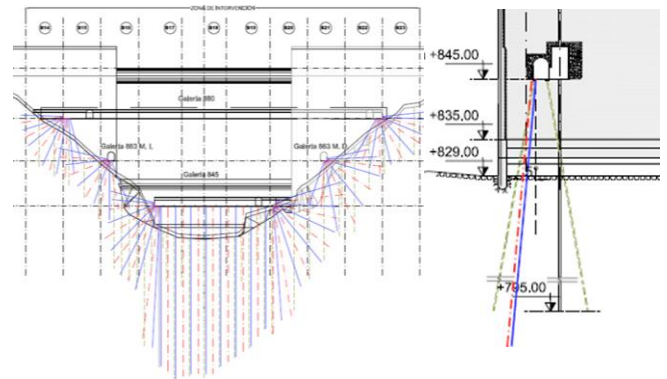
A proposal to recover the foundation's waterproofing curtain is shown.
